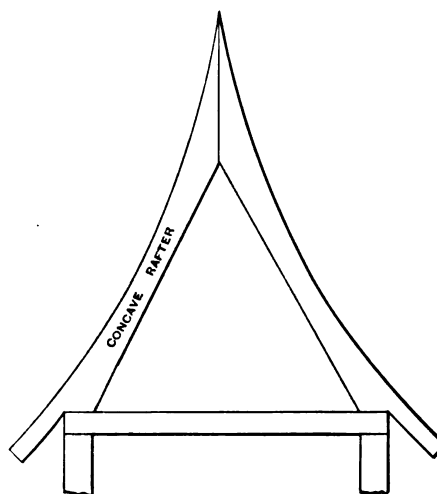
Conical Tower Roof with Rafters Concave in Form.
